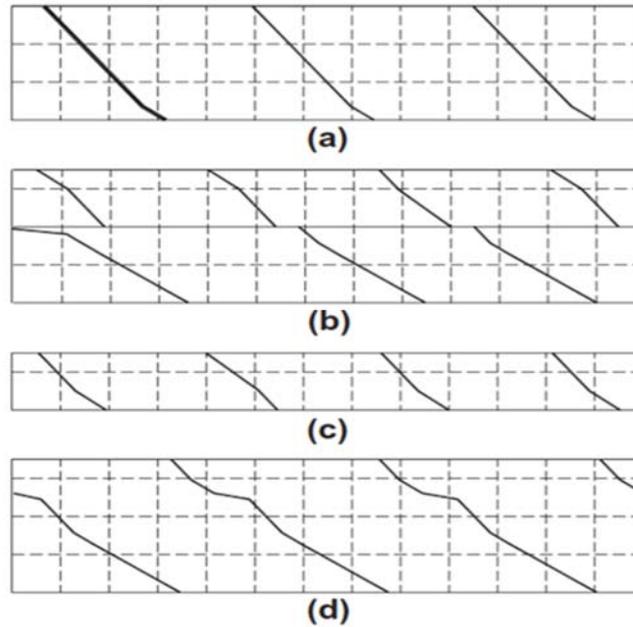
Typical cracking pattern for all tested beams (a) top, (b) front, (c) bottom, and (d) back.
